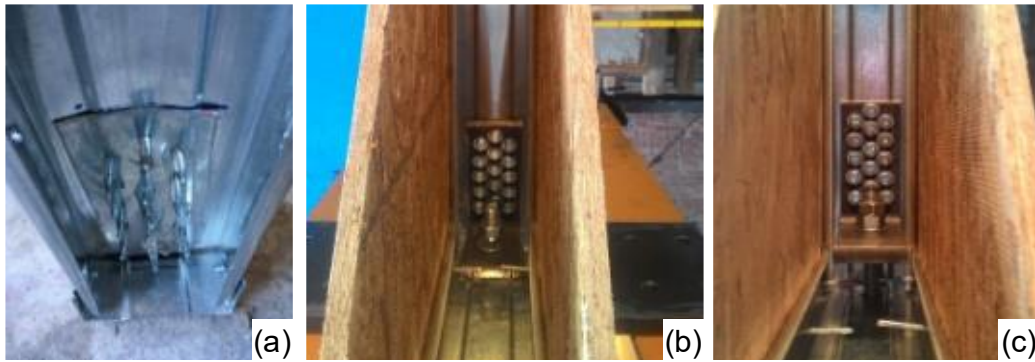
Additional construction details used in specimens; (a) HD6-M3 (steel backing plate); (b) HD7-M2 (hold down cut short); (c) HD7-M3 (gap between hold down and CFS framing member)
